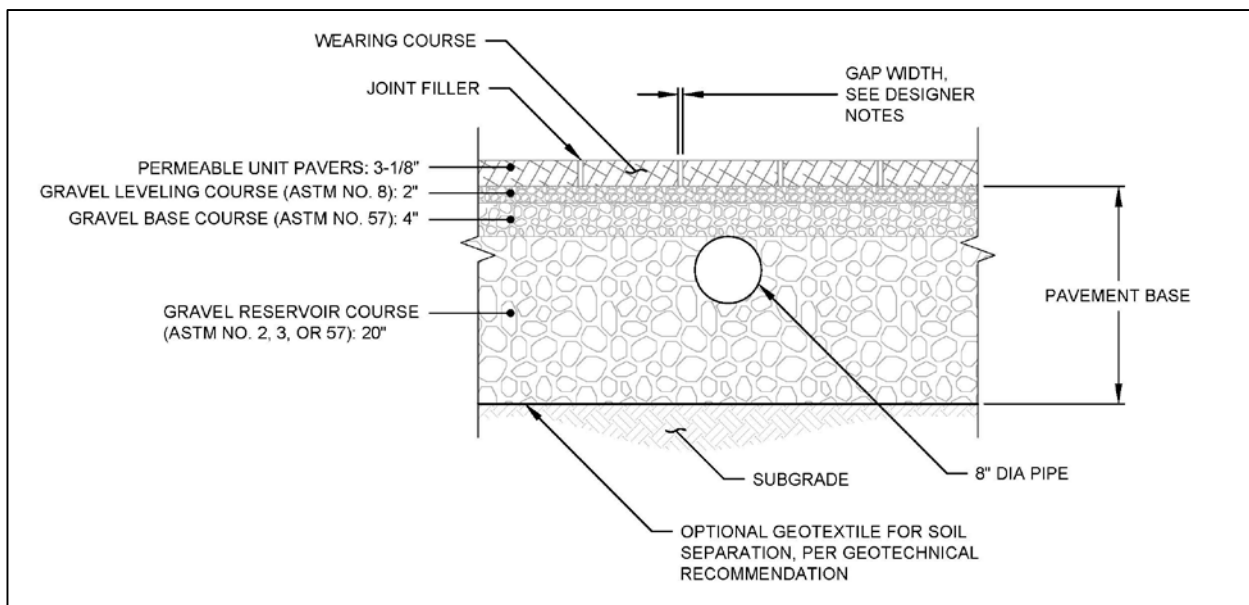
Pavement Infiltration System Cross Section for Parking at the Lopez Village Farmers Market (Assumes Light Vehicular Traffic and Poor Soils).
